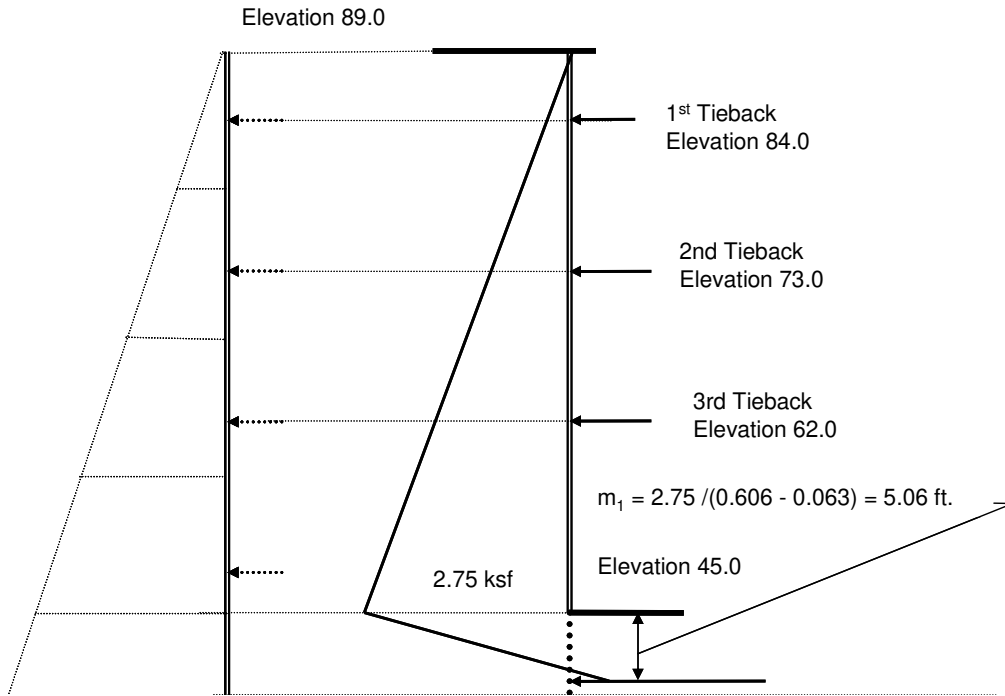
Excavate to elevation 45 – fourth stage excavation
